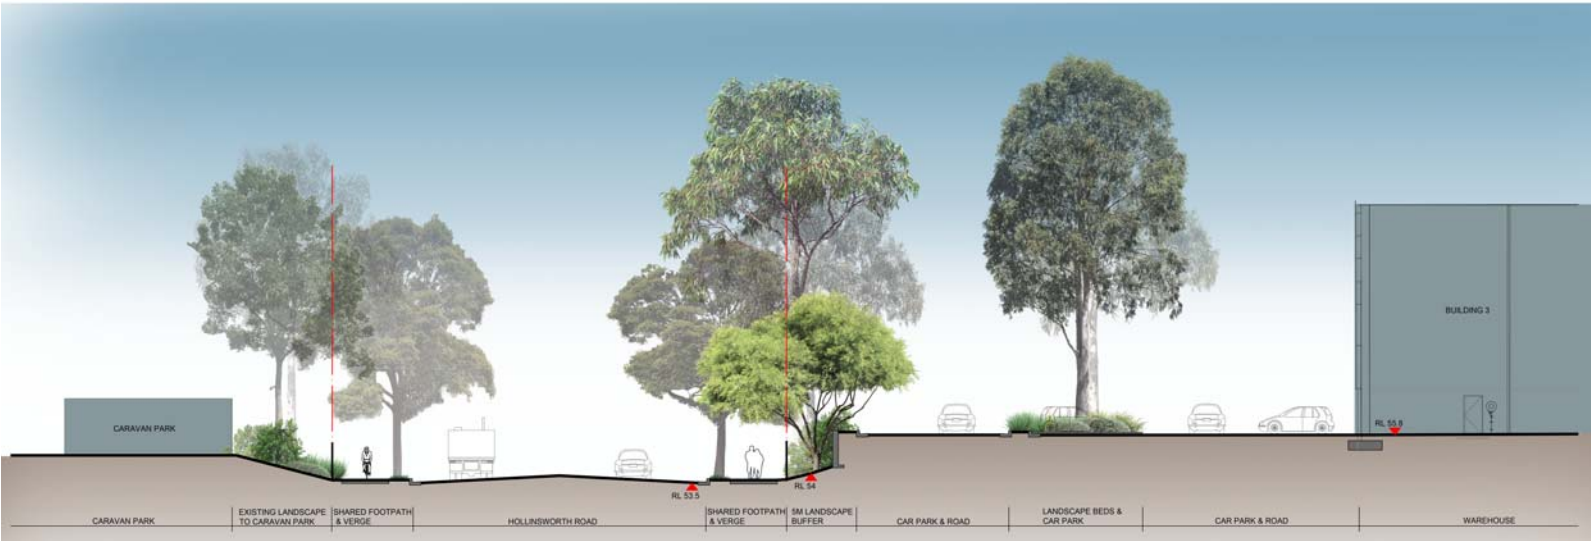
SECTION THROUGH THE NORTHERN HOLLINSWORTH ROAD BUFFER (BUILDING 3)
